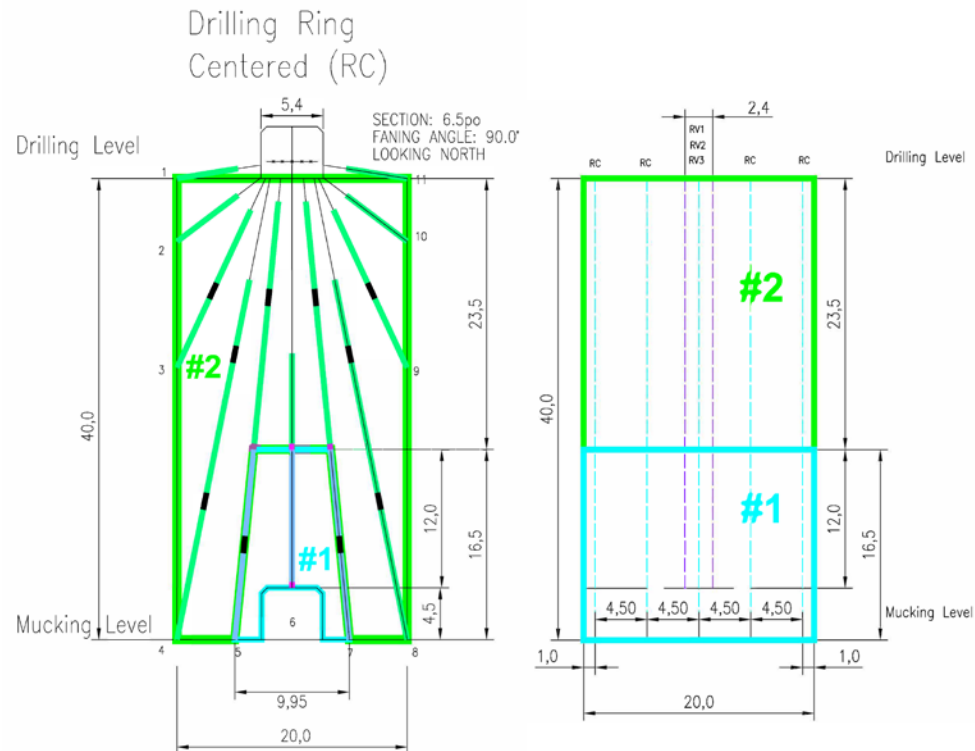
Typical drilling and blasting pattern for levels L710 to L830
